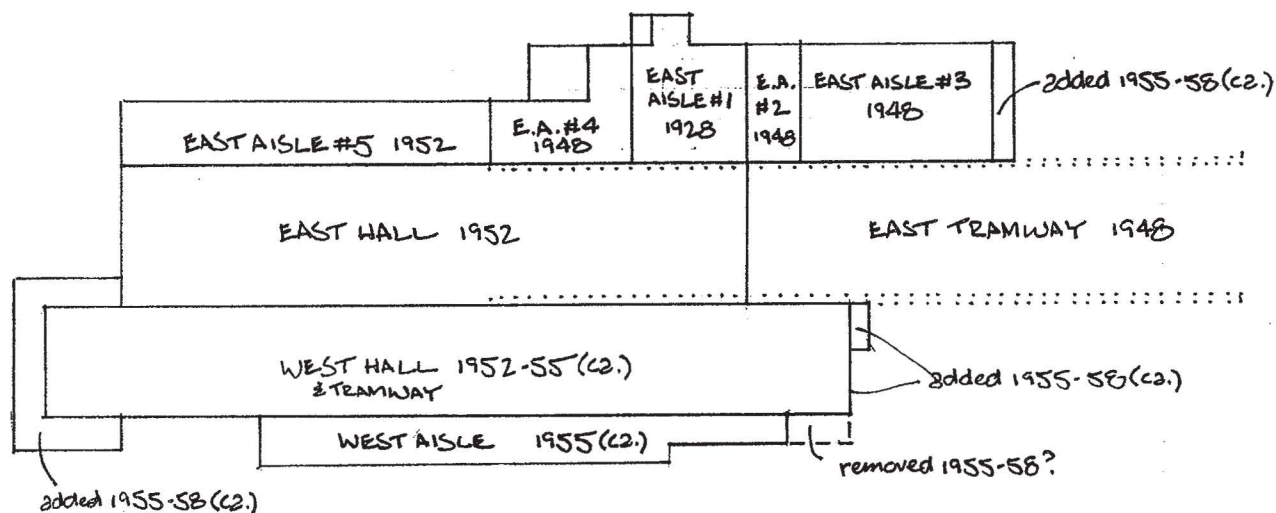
PRINCIPAL MILL BUILDING- SHOWING
